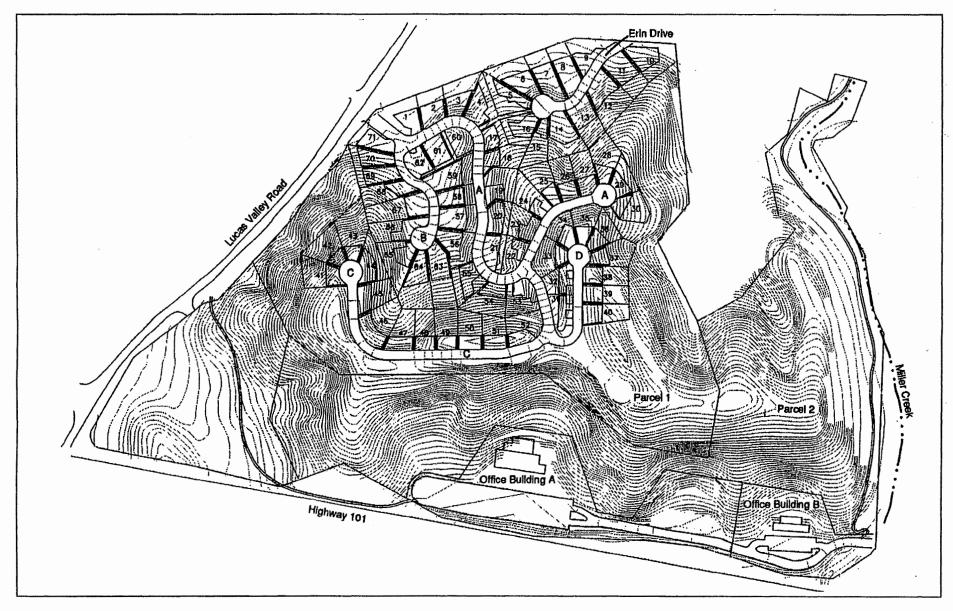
PREVIOUS PROPOSED PROJECT Oakview Master Plan
